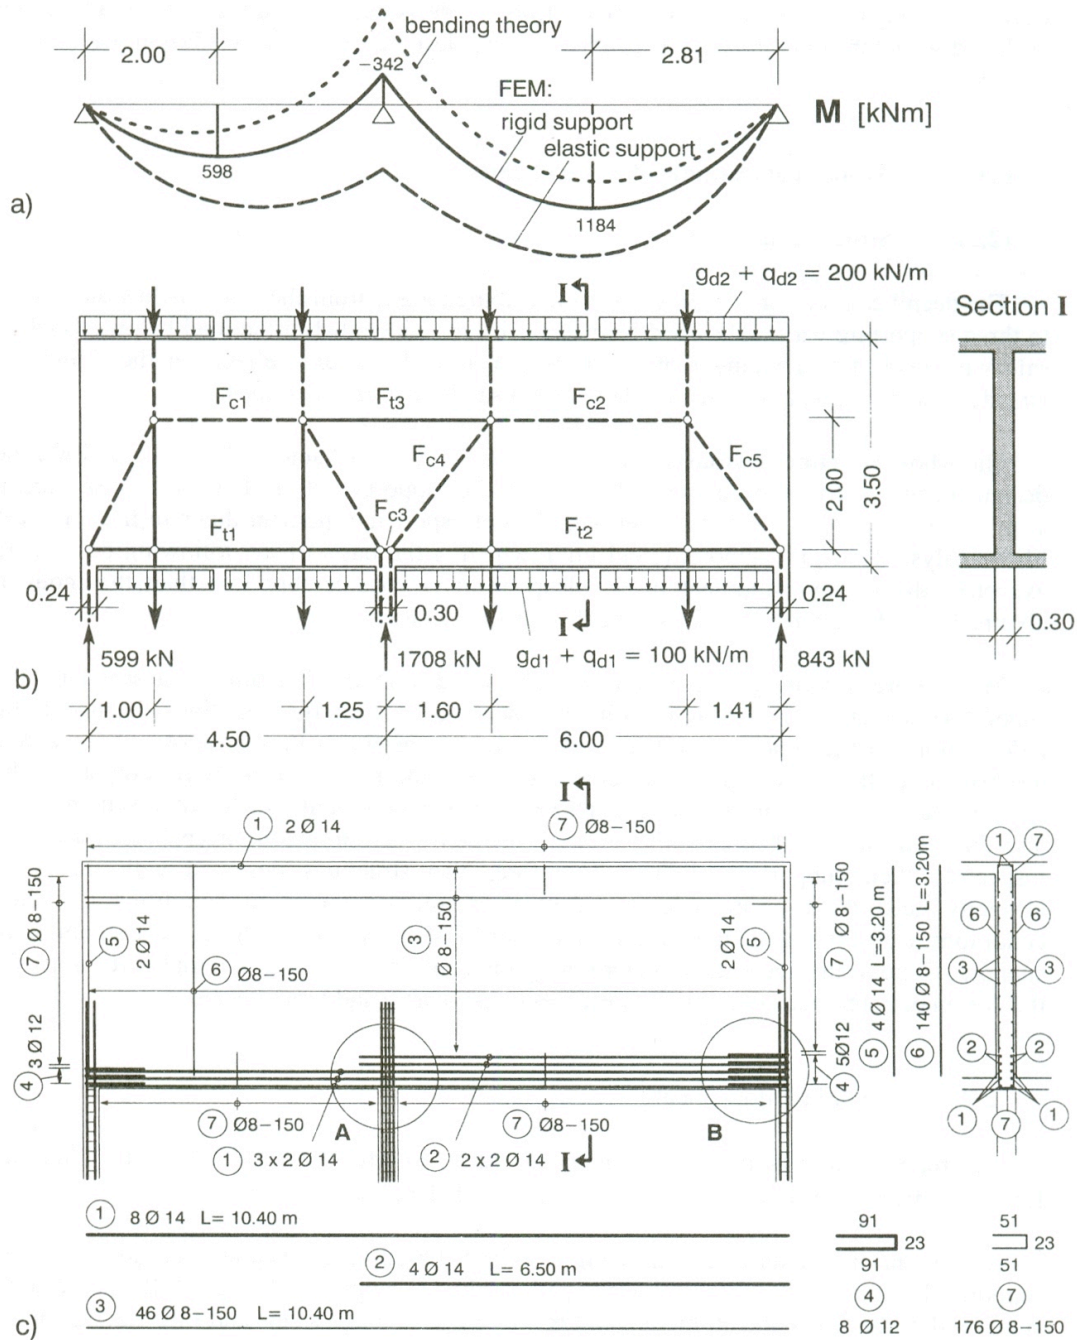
Continuous deep beam (concrete C30/37, steel S500). a) Sectional effects. b) Strut-and-tie model. c) Reinforcement
